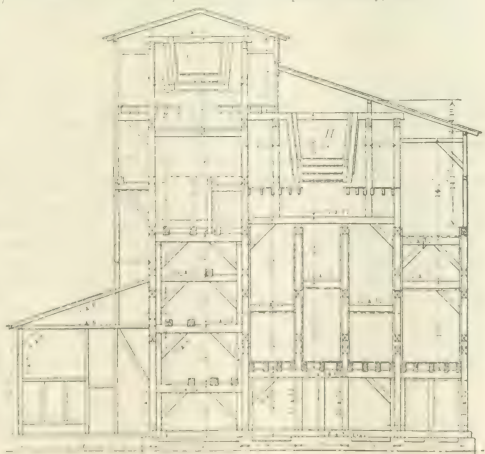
CAPOUSE WASHERY.—TRANSVERSE SECTION.
